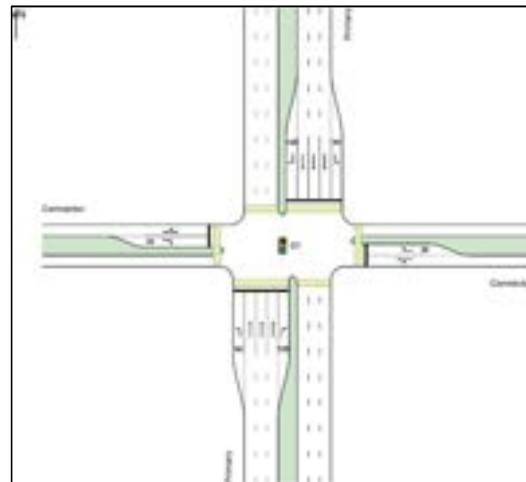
IN-01 intersection layout, as per the VPA standard benchmark design layout
